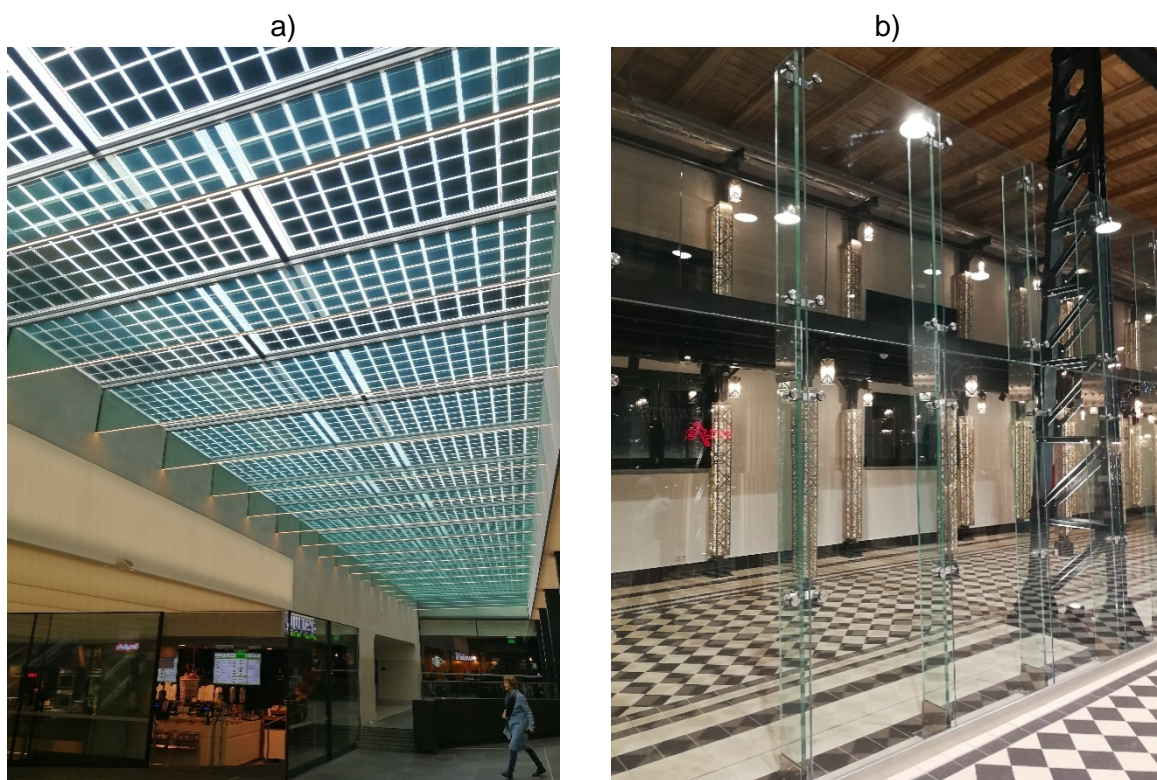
Examples of structural applications of glass: a) Load-bearing glass beams of a skylight at the train station in Eindhoven, The Netherlands, b) Load-bearing glass fins of a partition wall at the train station in Śląska, Poland(photo M. Kozłowski)
